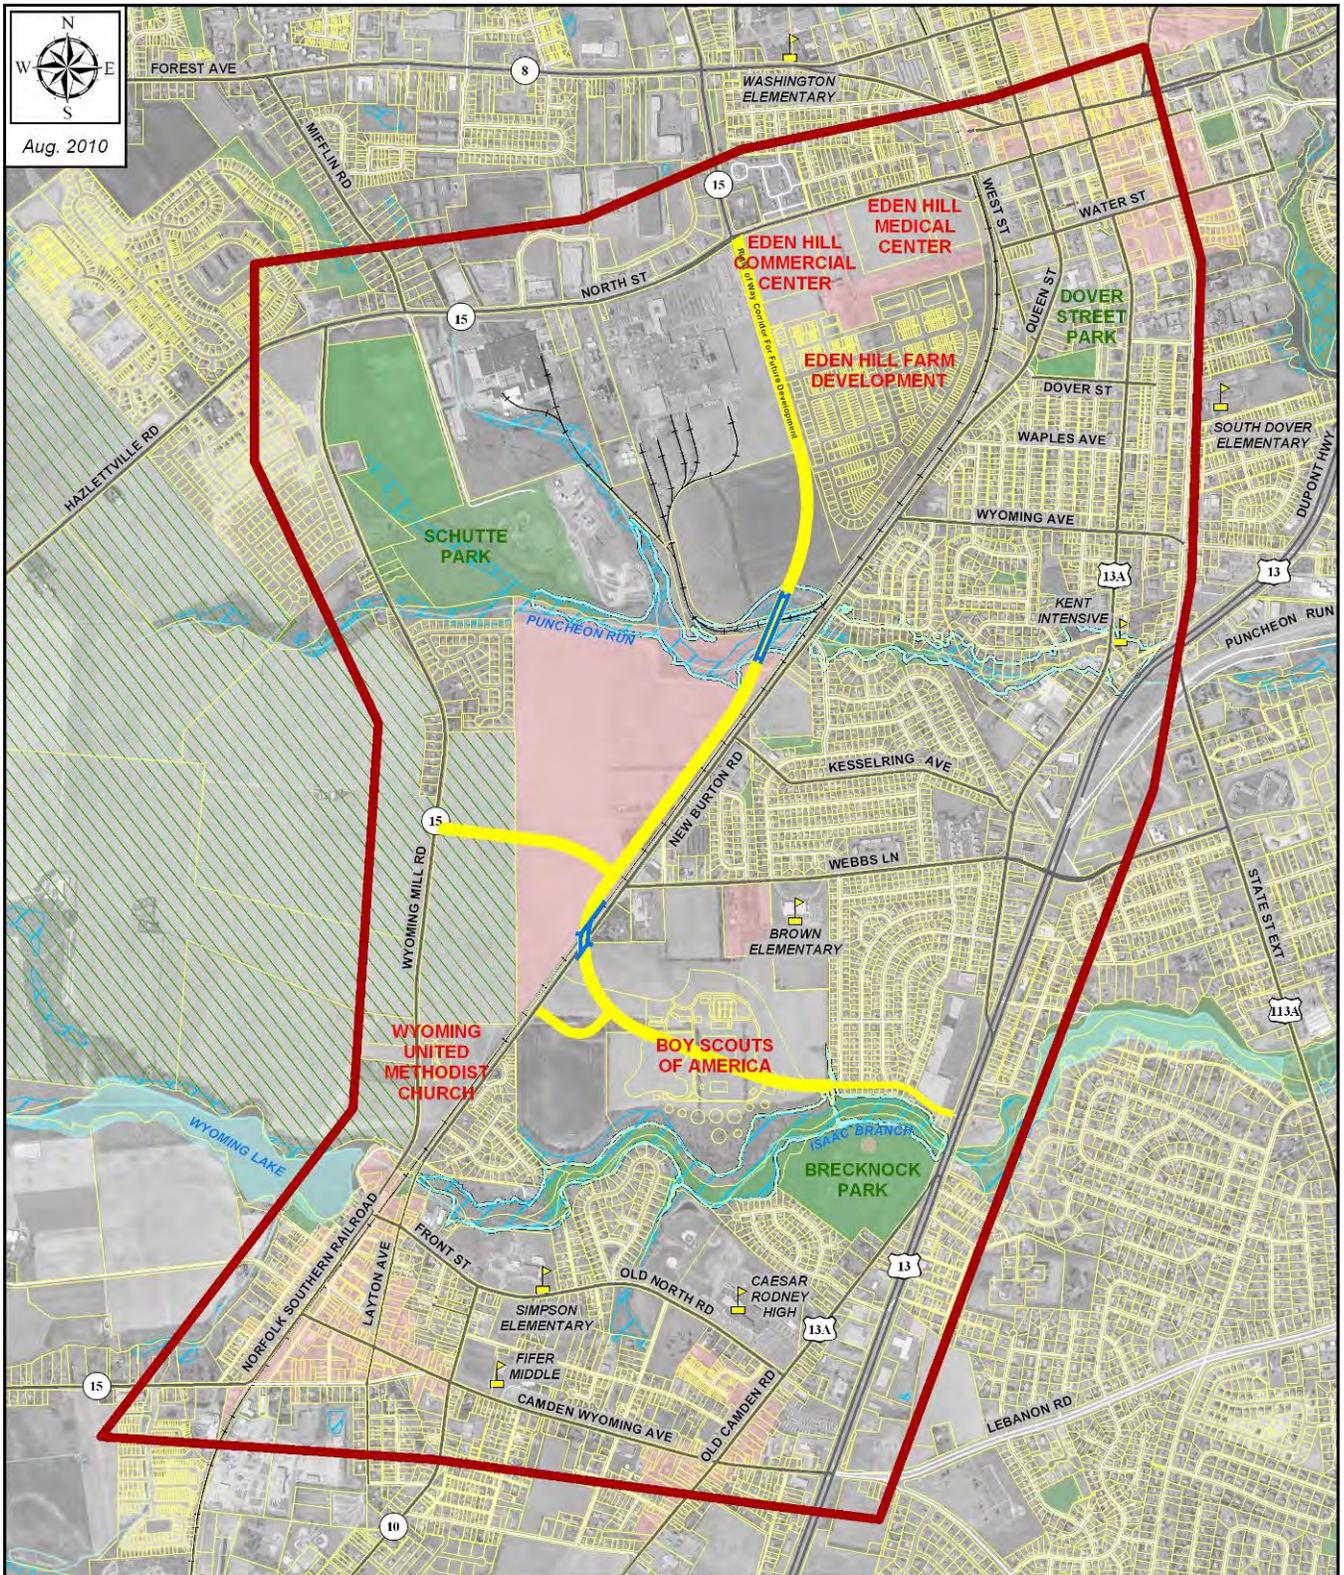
Concept #5B: Connection to Charles Polk Road to US 13, Auxiliary Connection to Wyoming Mill Road
